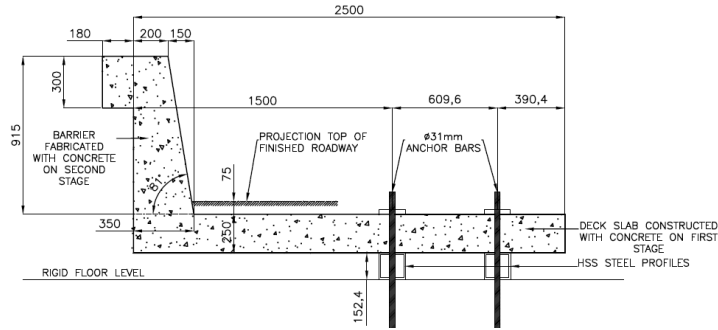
Typical deck slab overhang – Barrier structure geometry. All dimensions in mm.
